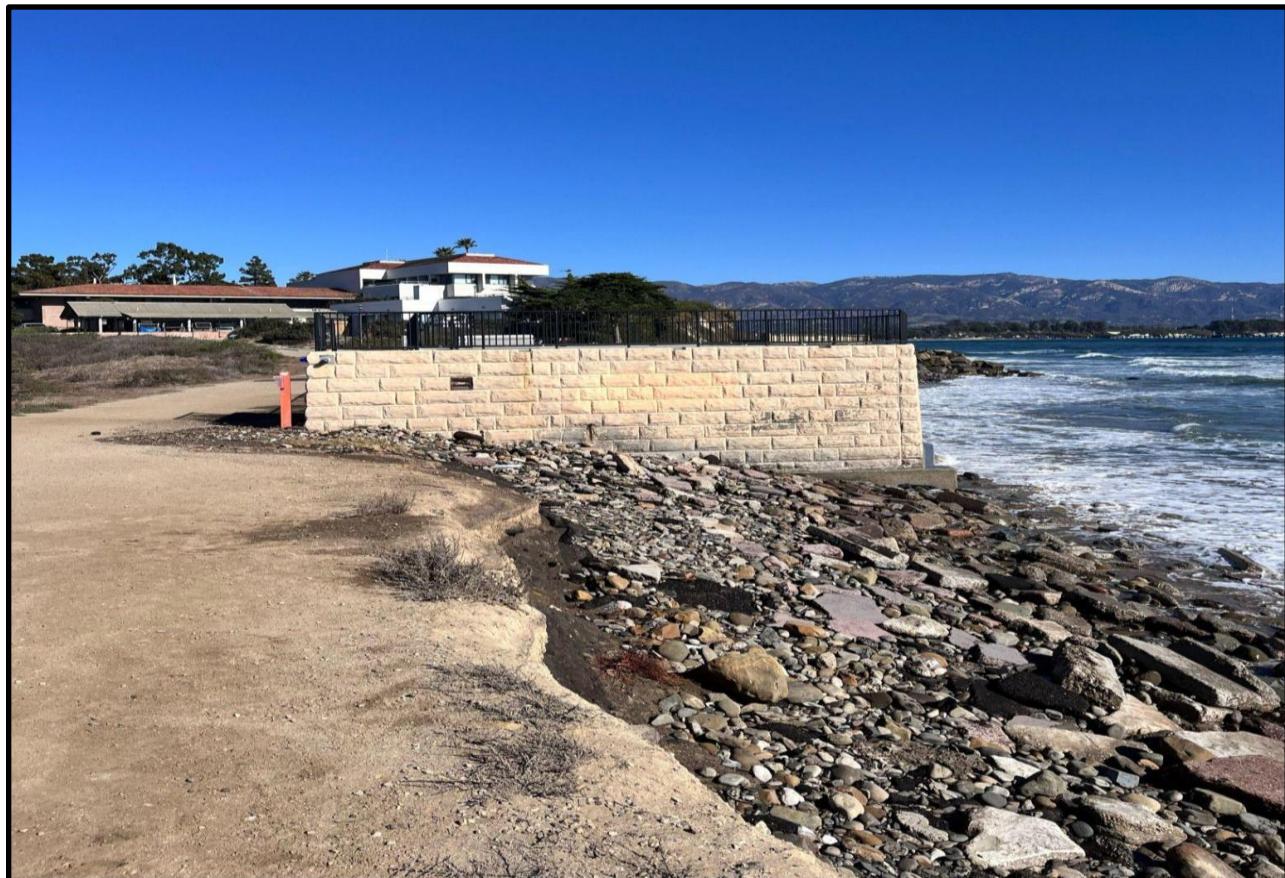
Campus Point Pump House, Looking Northeast (1/5/2025)
